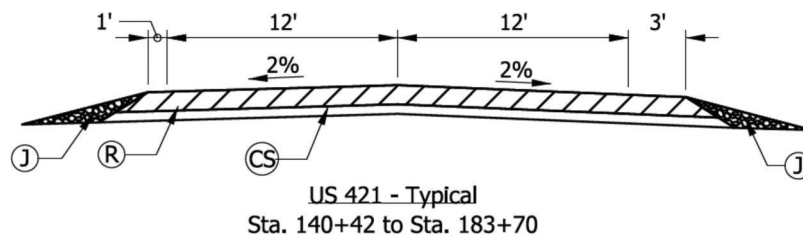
Typical cross section for most of U.S. 421 projects west of Delphi, IN.
